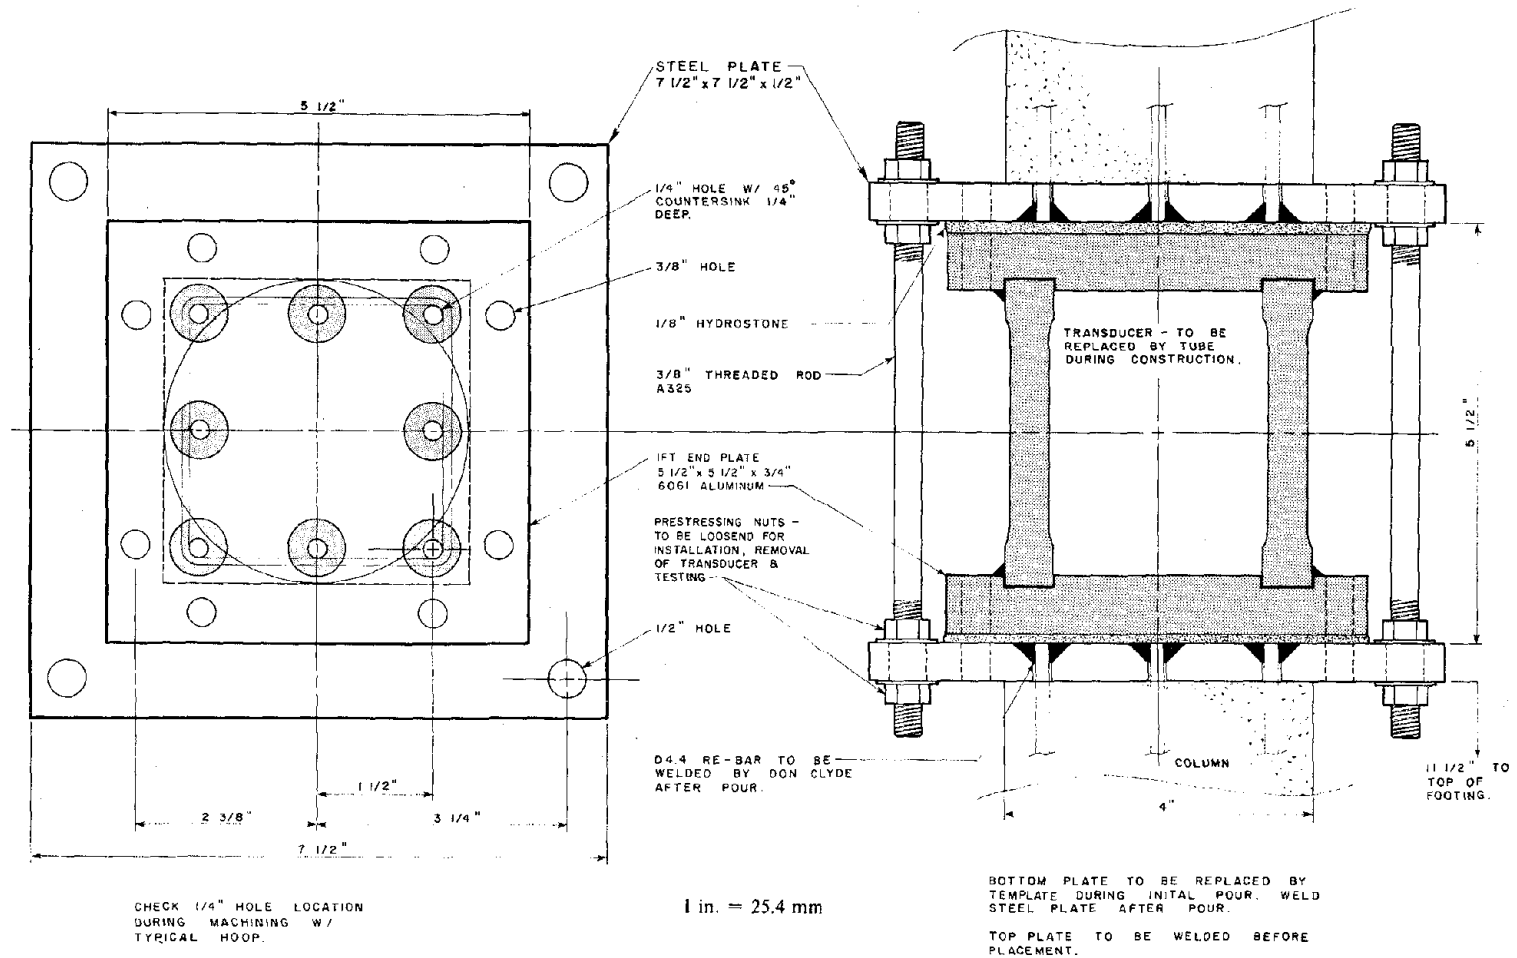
MOUNTING DETAILS FOR THE FORCE TRANSDUCER.
